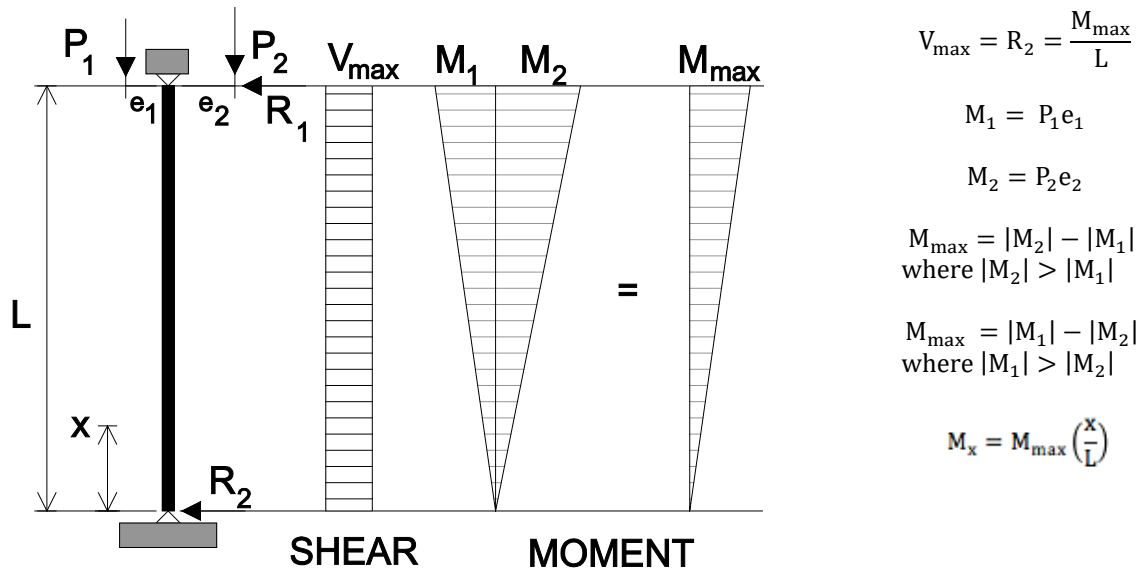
Simple Beam (Wall or Column)—Eccentric Point Load
